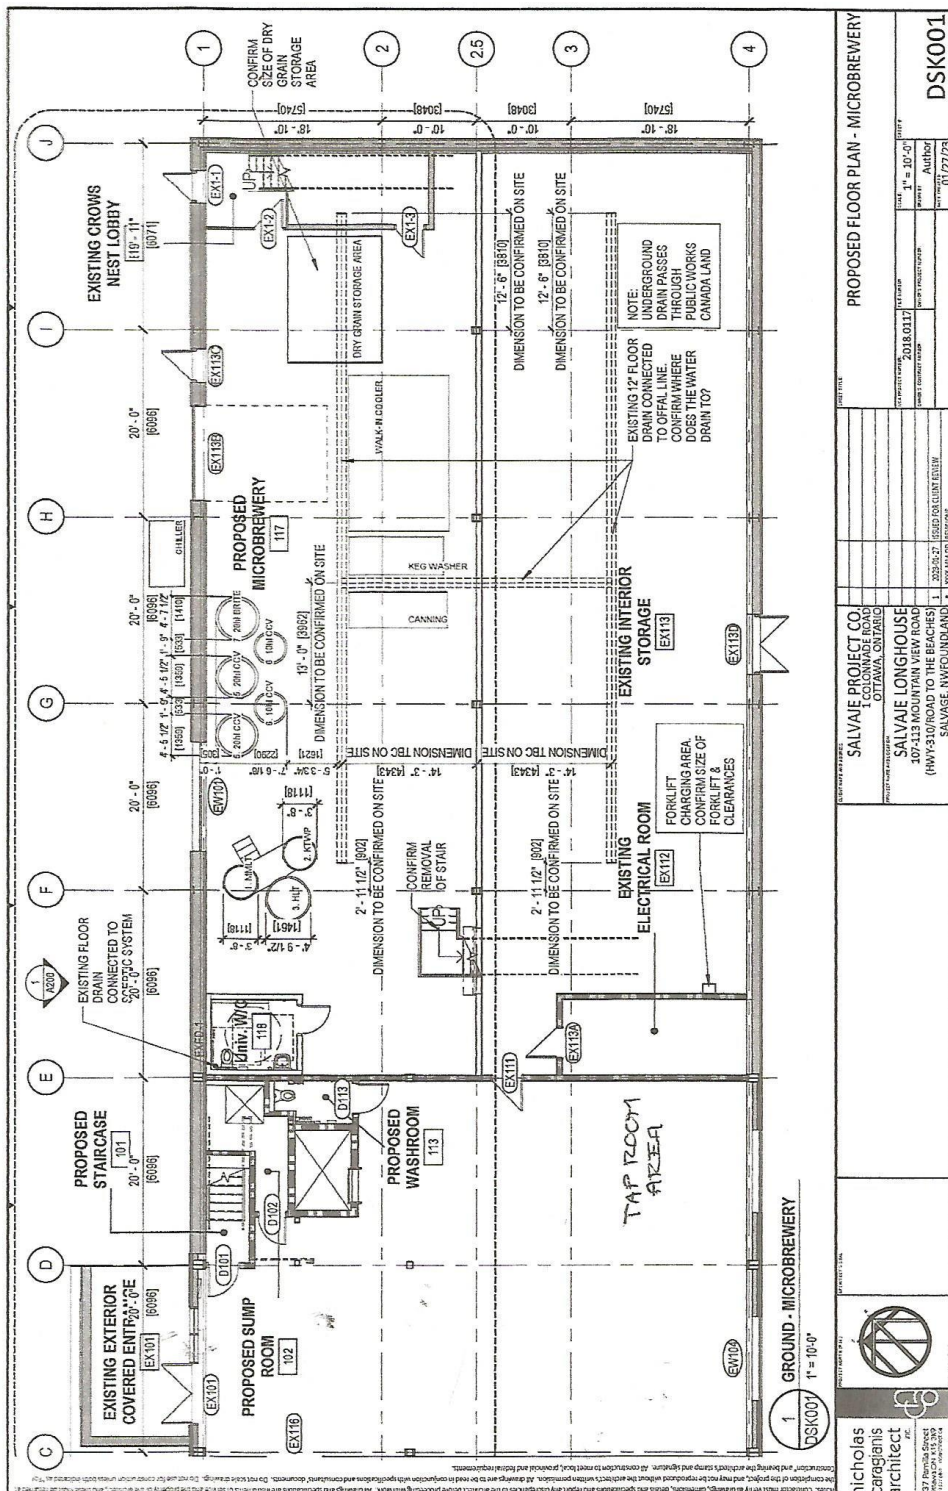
Floor Plan Showing the Salvaje Brewing Company Microbrewery Operation
